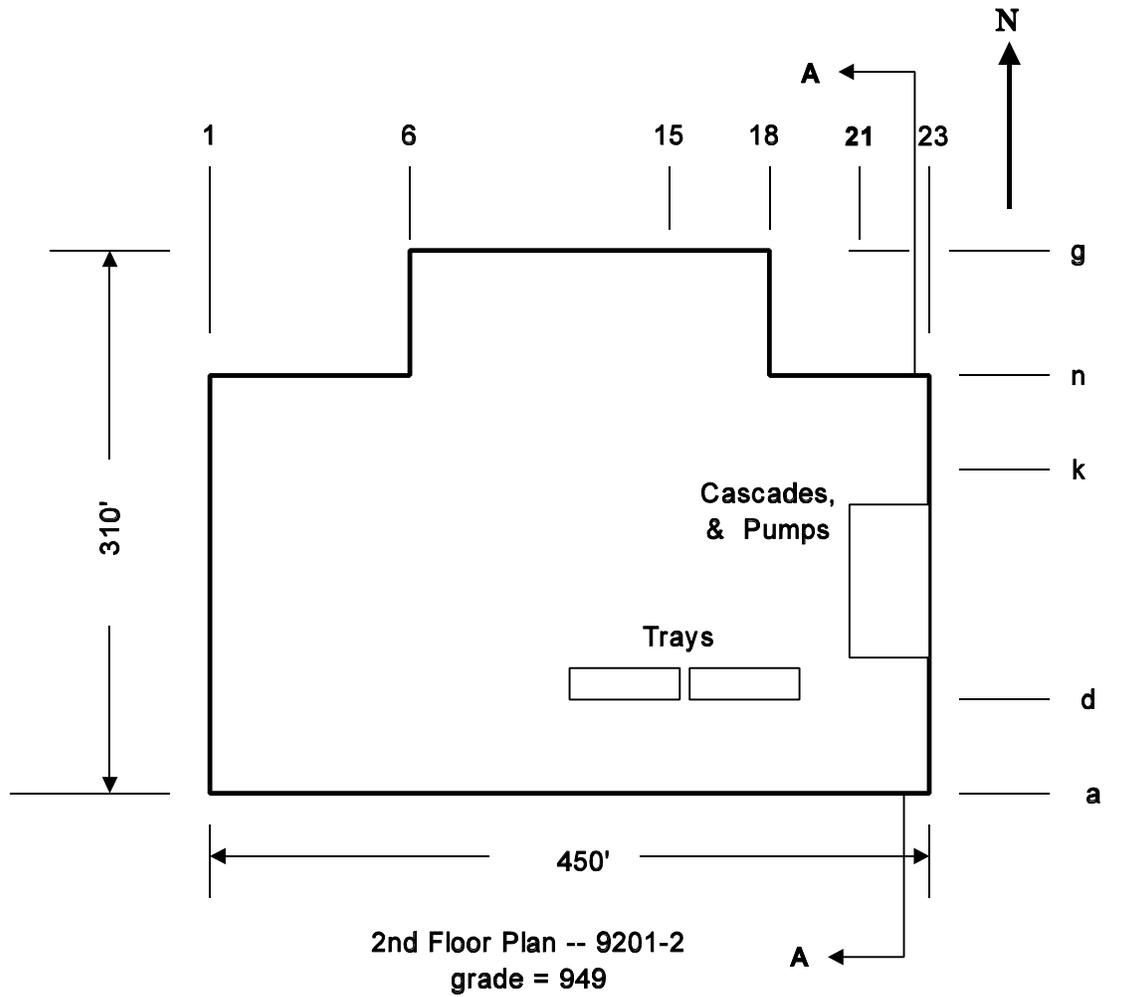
is a 2nd floor plan and a sectional elevation of Building 9201-2. It is provided here to show the location of the Colex Pilot Plant that existed there in the early 1950's. As shown in Figure 1, two absorber trays were located along column line d between column lines 15 and 20. Floor area occupied by this equipment was approximately 20 x 90 feet, or 1800 ft<sup>2</sup>. These two trays are shown on drawing E-HV-20238. A third tray was documented in an Industrial Hygiene air sampling report dated 12/19/54. I assume it was in the same vicinity and occupied about 1200 ft<sup>2</sup>. Other components of the Colex Pilot Plant, consisting of columns, pumps, etc., were installed along the east end of the building between column lines d and k. They occupied a floor area of approximately 4000 ft<sup>2</sup> on three floors. The total building volume that was occupied by the Colex Pilot Plant is estimated to be 525,000 ft<sup>3</sup>.
